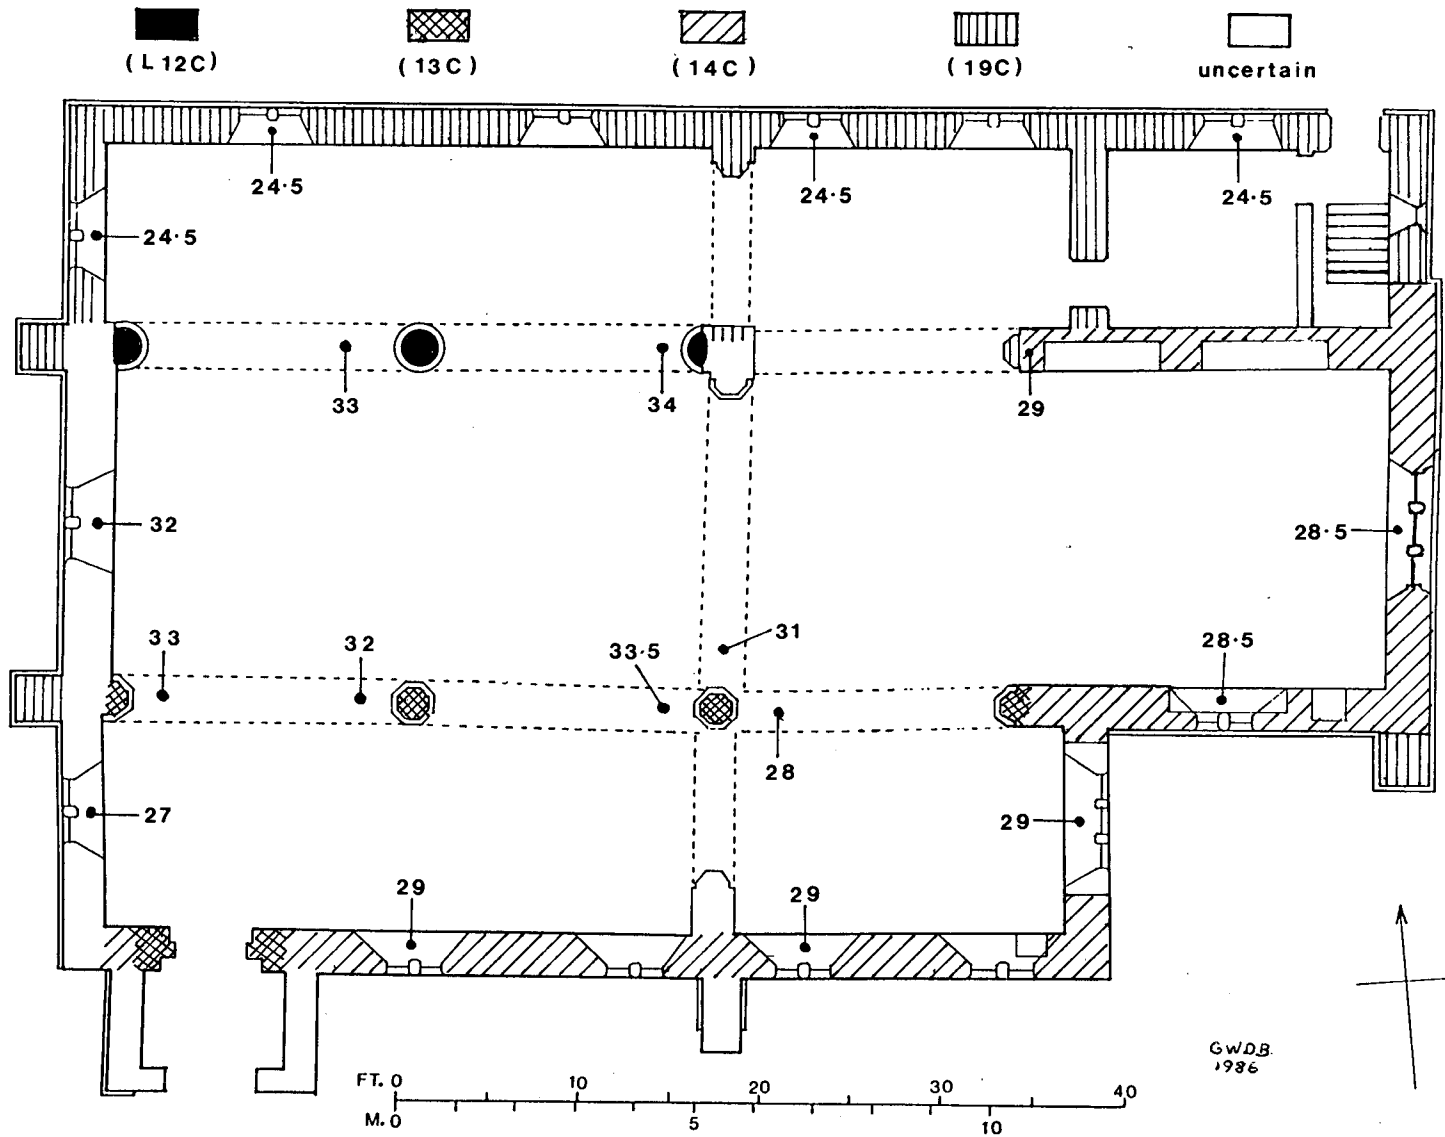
Plan of church, with wall thickness in inches and tentative dating.
